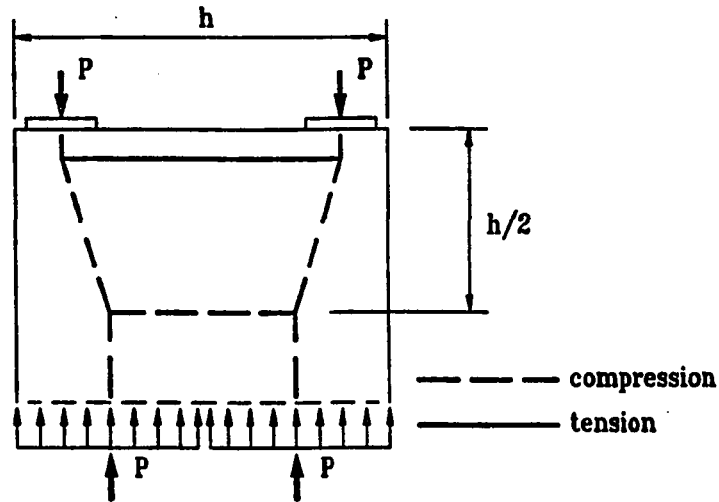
Spalling Forces Between Multiple Anchorages
